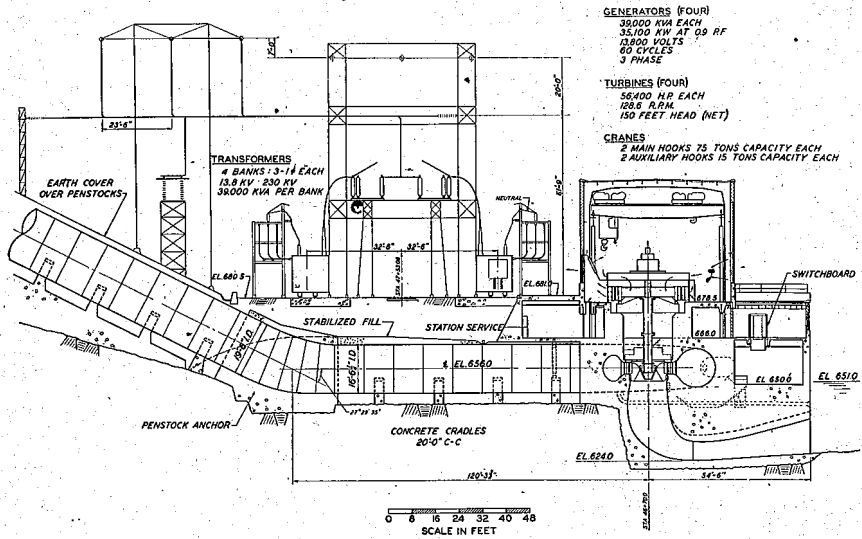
POWERHOUSE AND INTAKE—TYPICAL CROSS SECTION.
